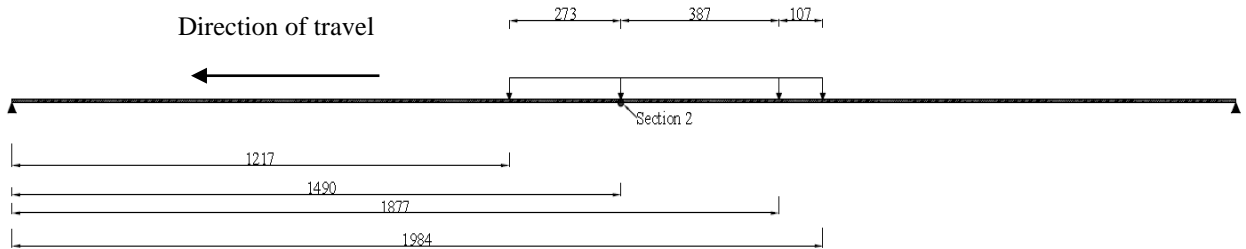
Longitudinal position of model truck on bridge for SECAN analysis, (all dimensions are in mm)
